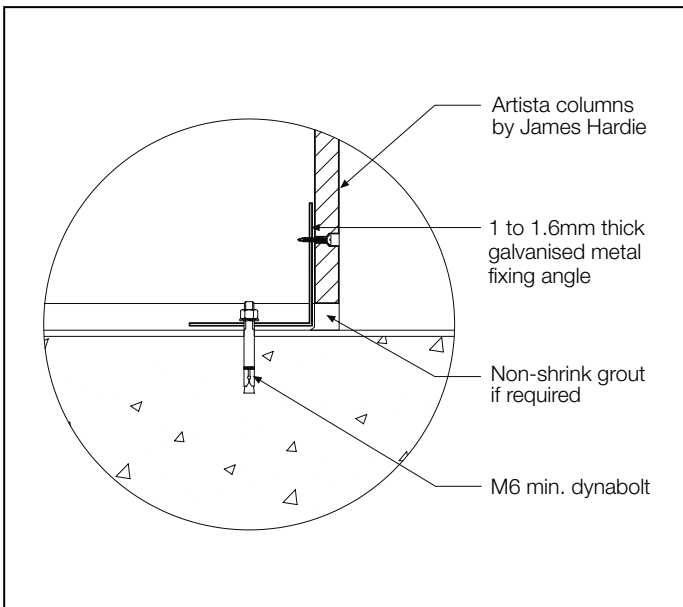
TYPICAL BASE FIXING DETAIL 1
